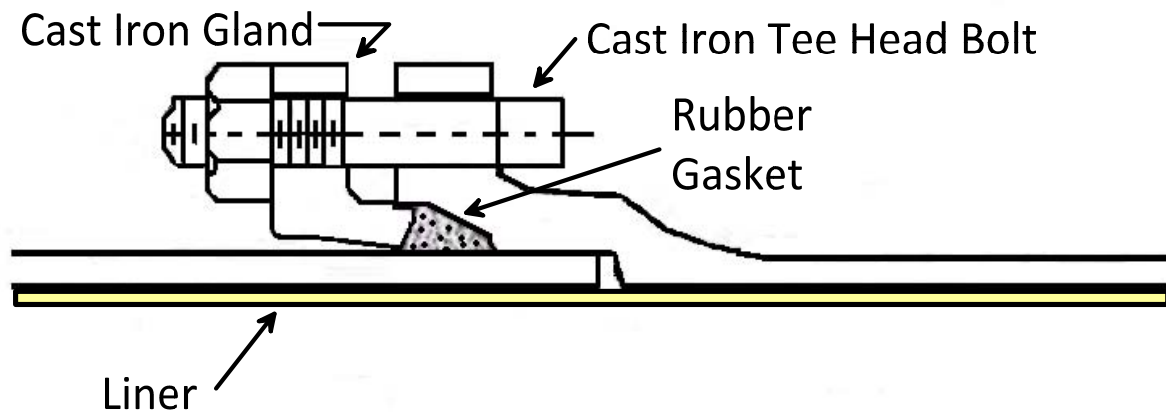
Schematic of Mechanical Clamp on 12 in. (300 mm) Pipe Specimens
